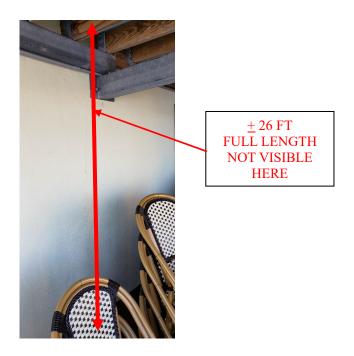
Location 19: Approximately 26 ft long new 16x8 concrete column. See detail 1/S101.
